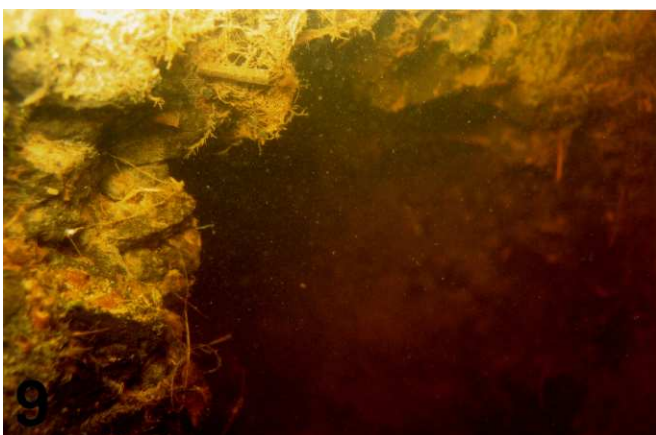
The scouring damage of concrete foundation of the bridge over river Salaca
